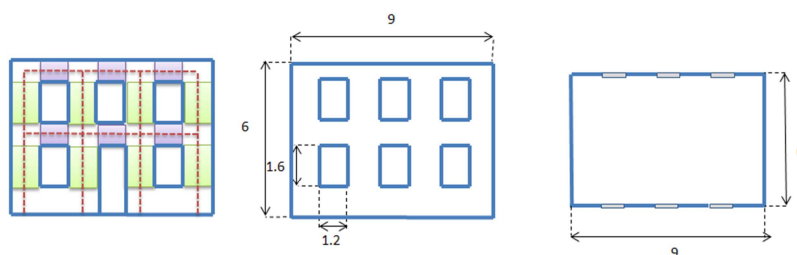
From left to right: front, rear and plan view of the typical masonry buildings considered in this study. The red dashed lines in the left drawing represent the frame modeling of the façade, discretized into piers (green elements) and spandrels (purple elements). These elements are connected through rigid links.
